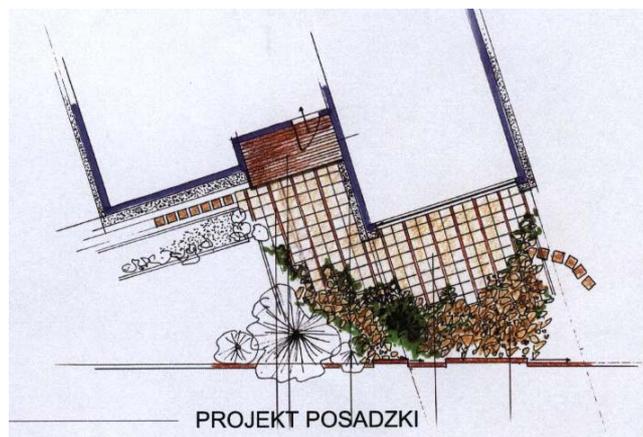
Exampe of a tile floor design (by stud. B.Bajon, supervised by arch. M.Banach).[13]
